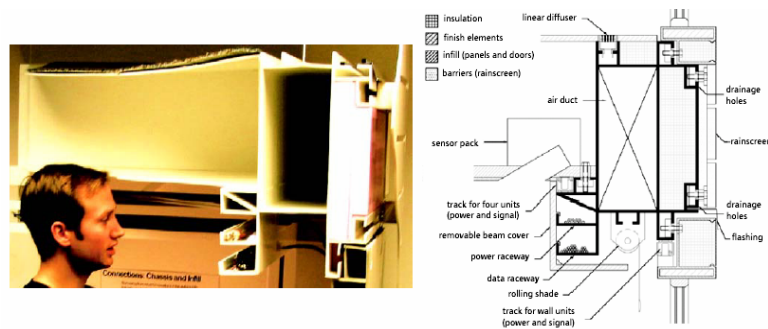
House_n pultrusion chassis — full-scale model (left) and detail drawing (right) of a prefabricated pultrusion chassis showing beams, column, connectors, raceway for power and data, attachments for exterior wall and floor, housing for equipment, exterior insulation, and linear diffuser . Source : (Lawerence , 2003)
